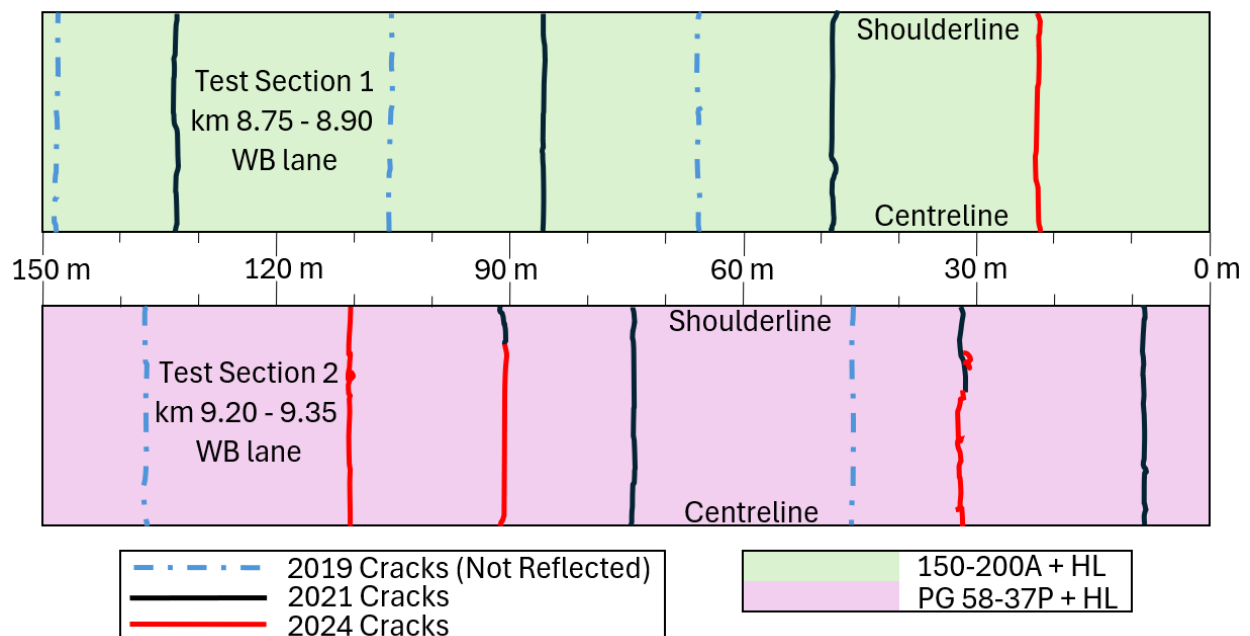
shows the progression of the transverse cracks occurring over time, with new cracking mapped out in each visual inspection. Progression of cracking after five years can be considered similar between the test sections, with the PG 58-37P+HL test section having one more transverse crack reflected through than the 150-200A+HL test section.
